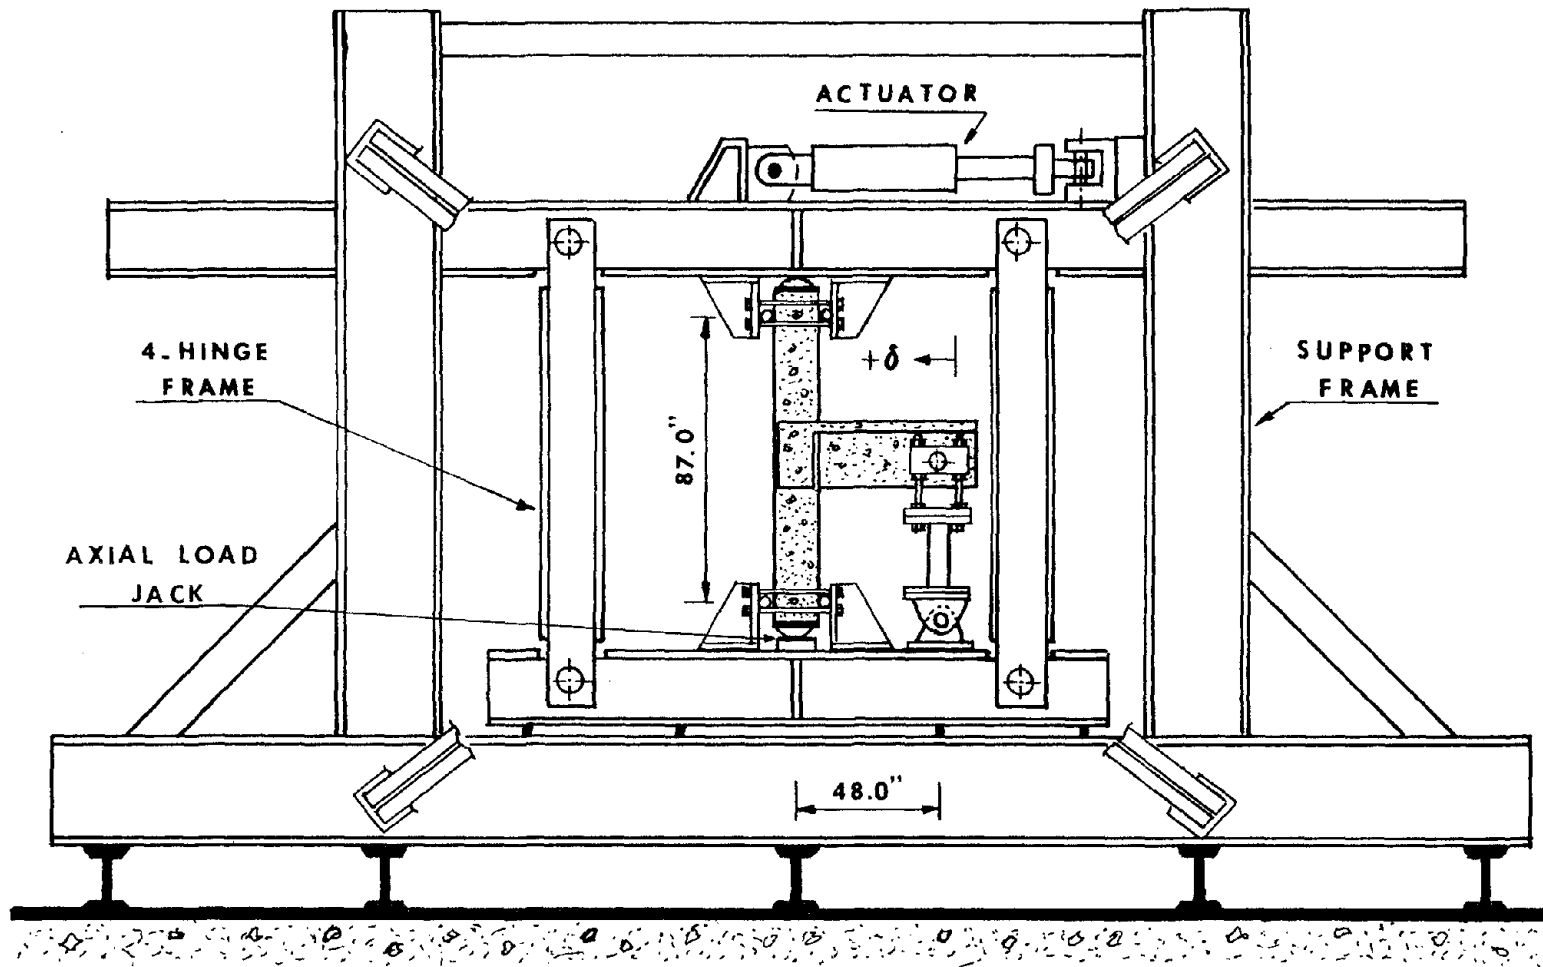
Testing Frame 2, Used for Specimens 5 through 12.
